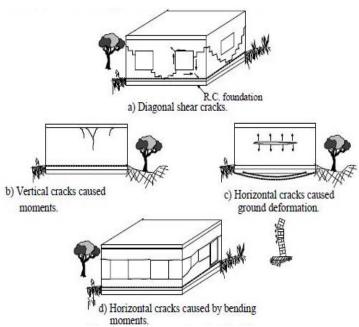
Common types of cracks in buildings with shallow foundations (Hussein Elarabi, 2000).
